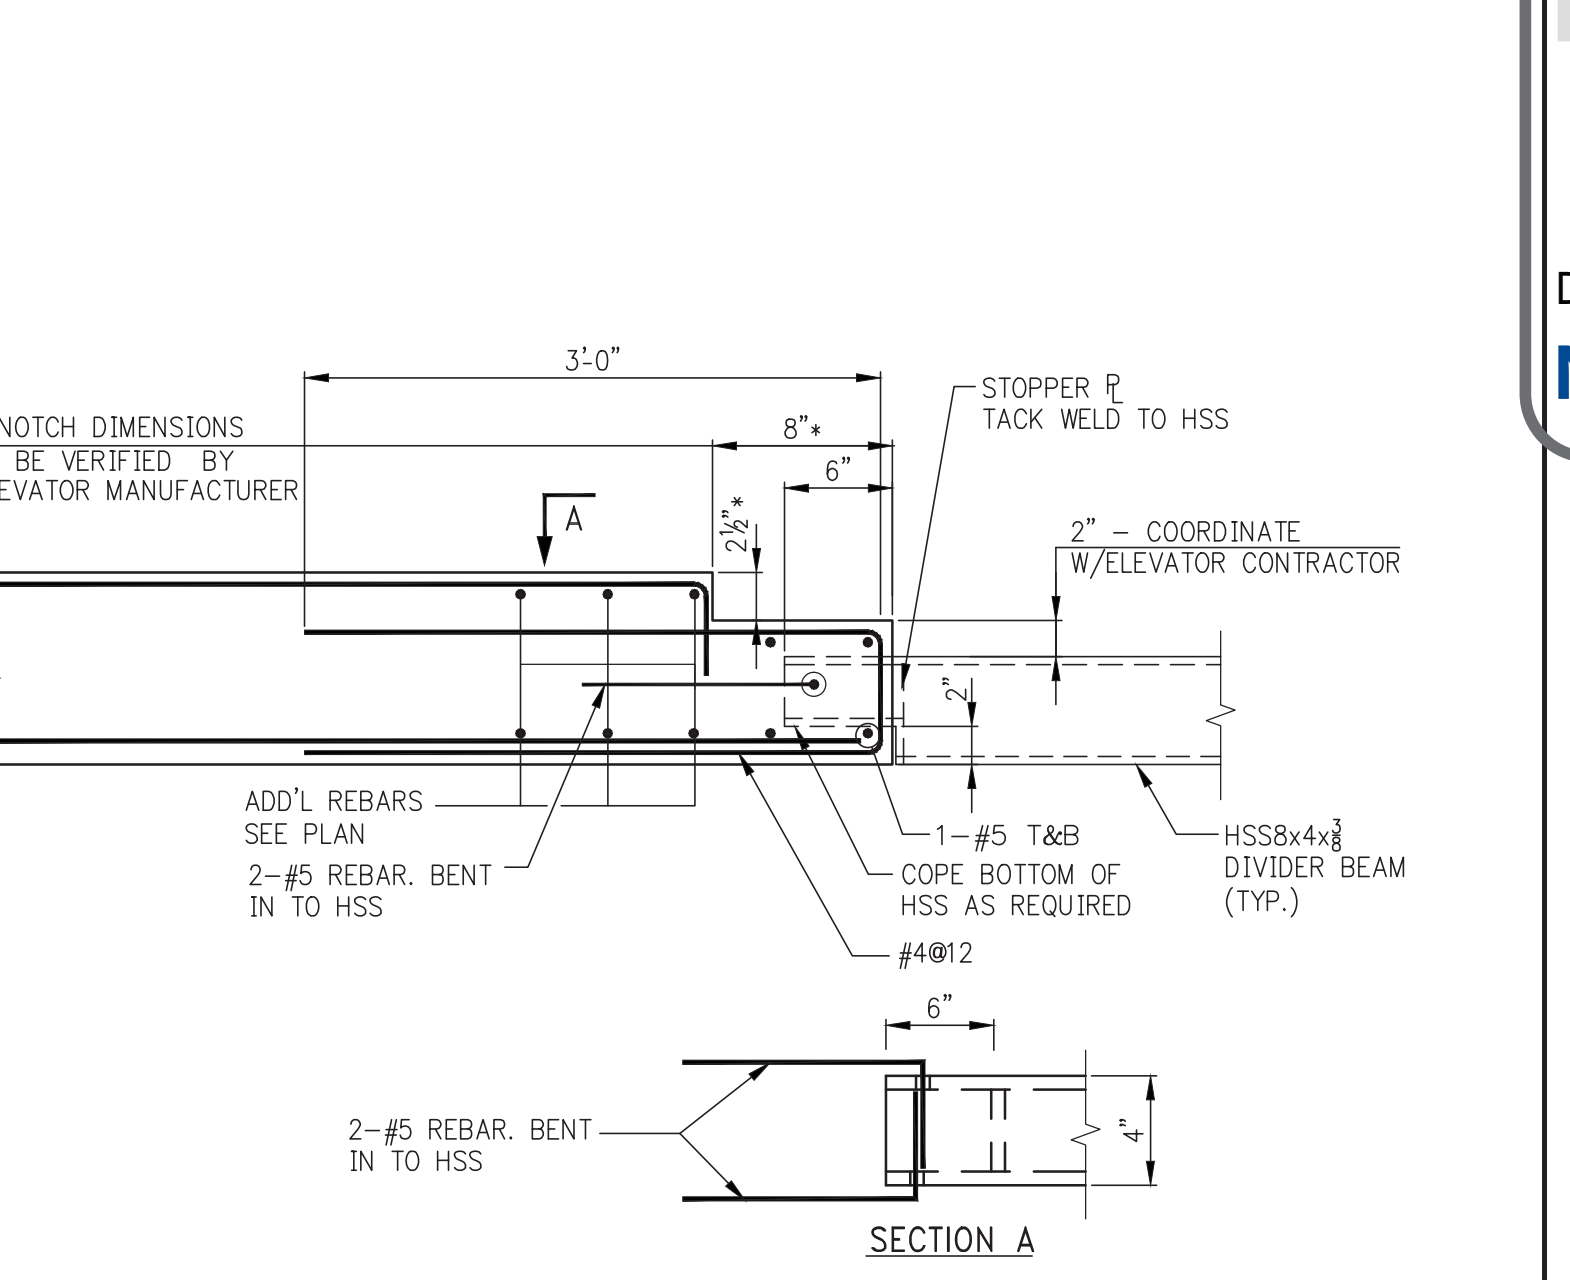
DETAIL OF ELEVATOR DIVIDER BEAM CONNECTION @ CONCRETE BEAM
